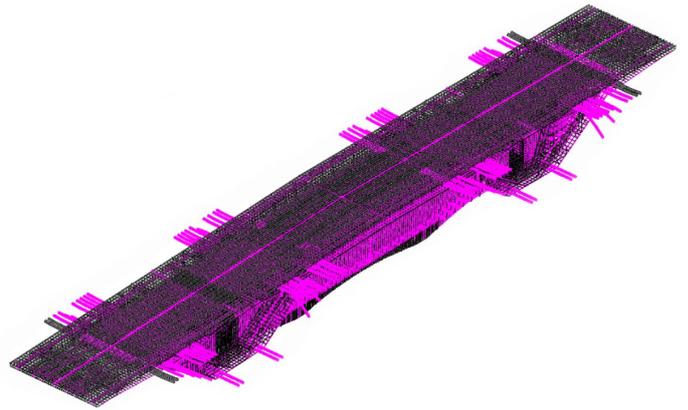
BrIM Rebar & PT Layout of Pier Segment
